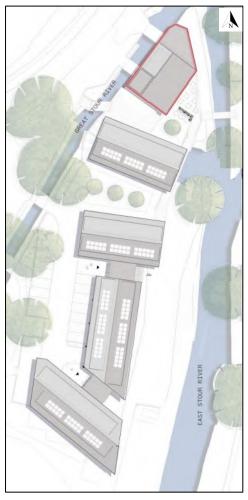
Proposed Site Layout (Hollaway Studio)
